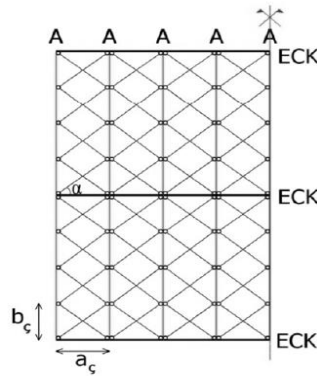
Representation of the roof covering by pairs of hinged elastic braces [13]
